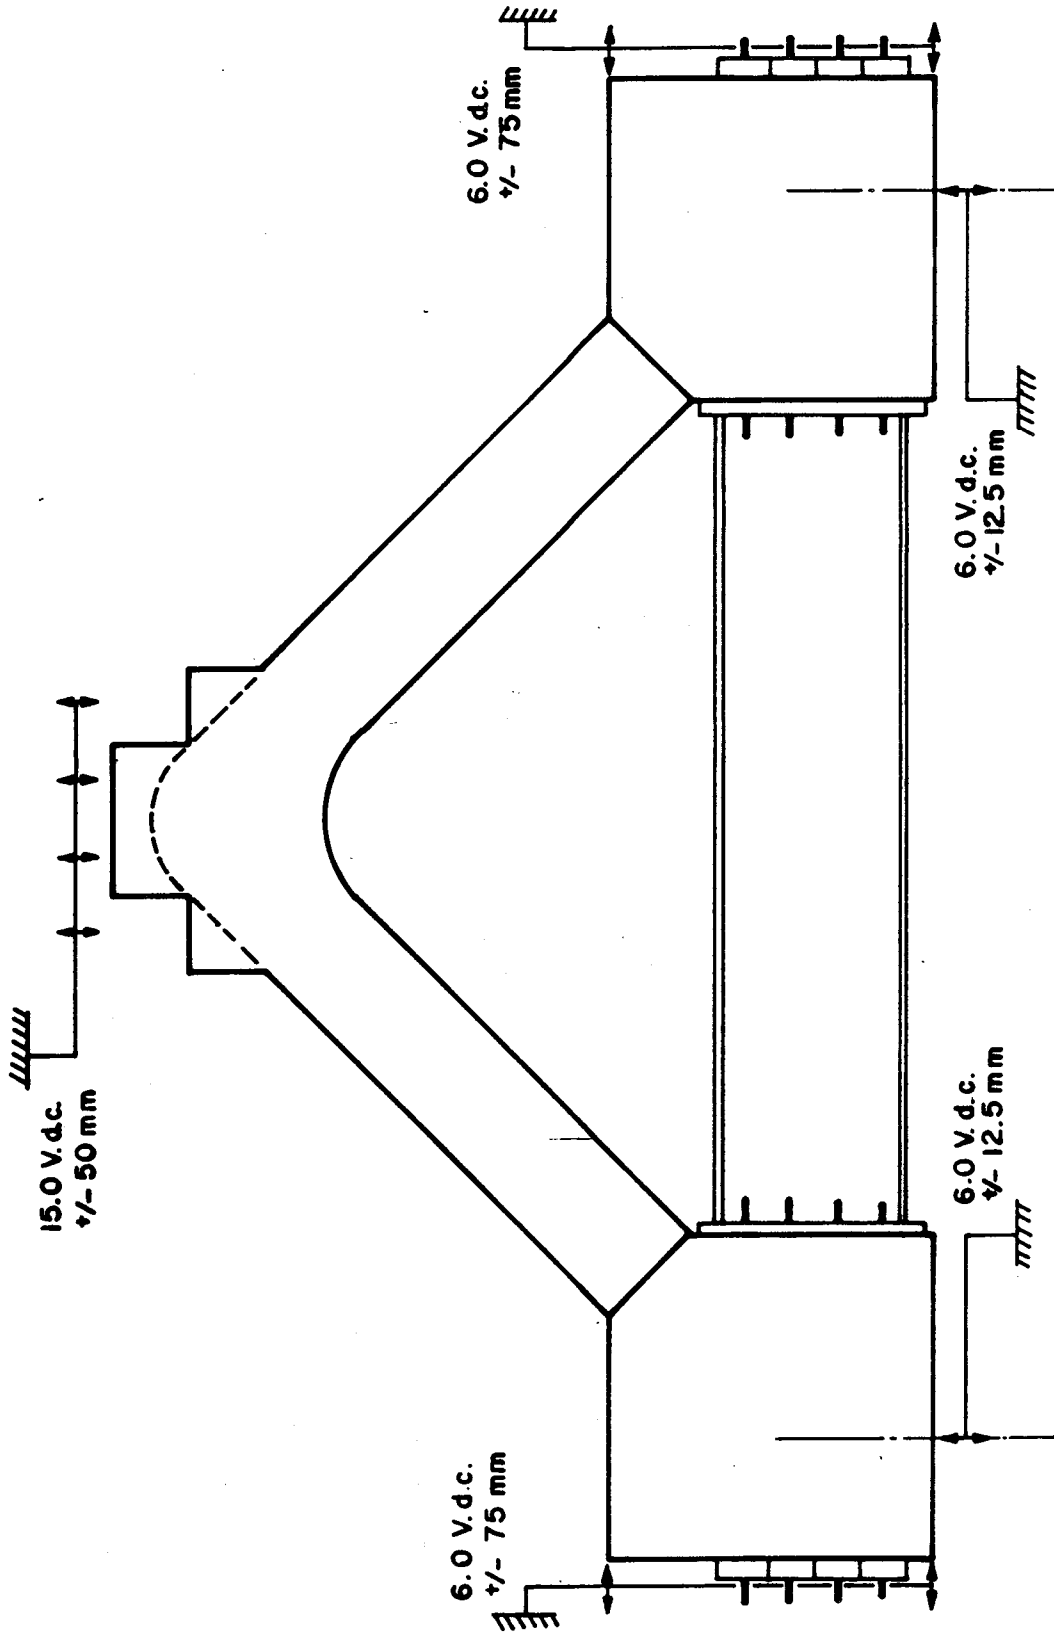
Typical Transducer Layout for the A Series Specimens
